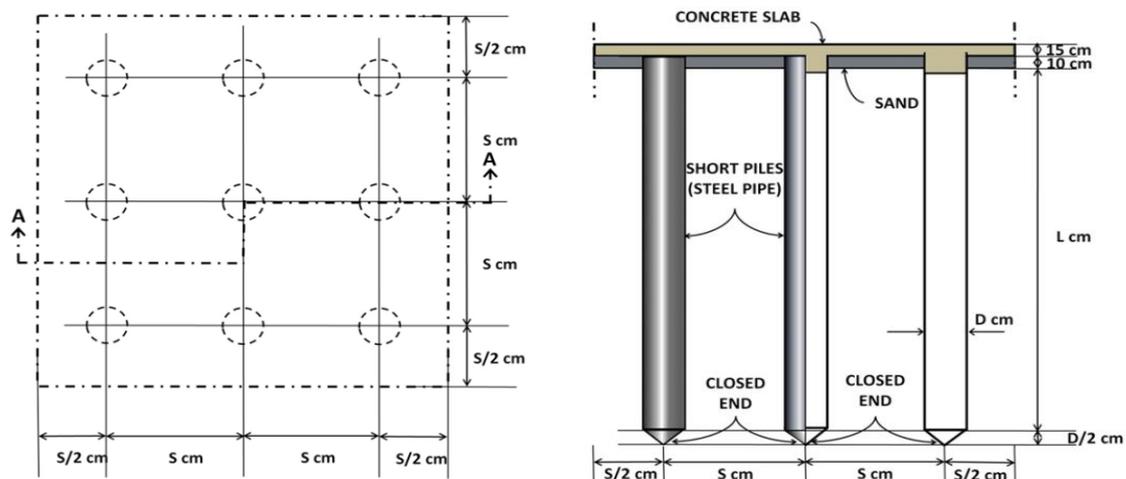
Short Piled Raft Foundation System; (a) general plan; (b) cross section A-A.
